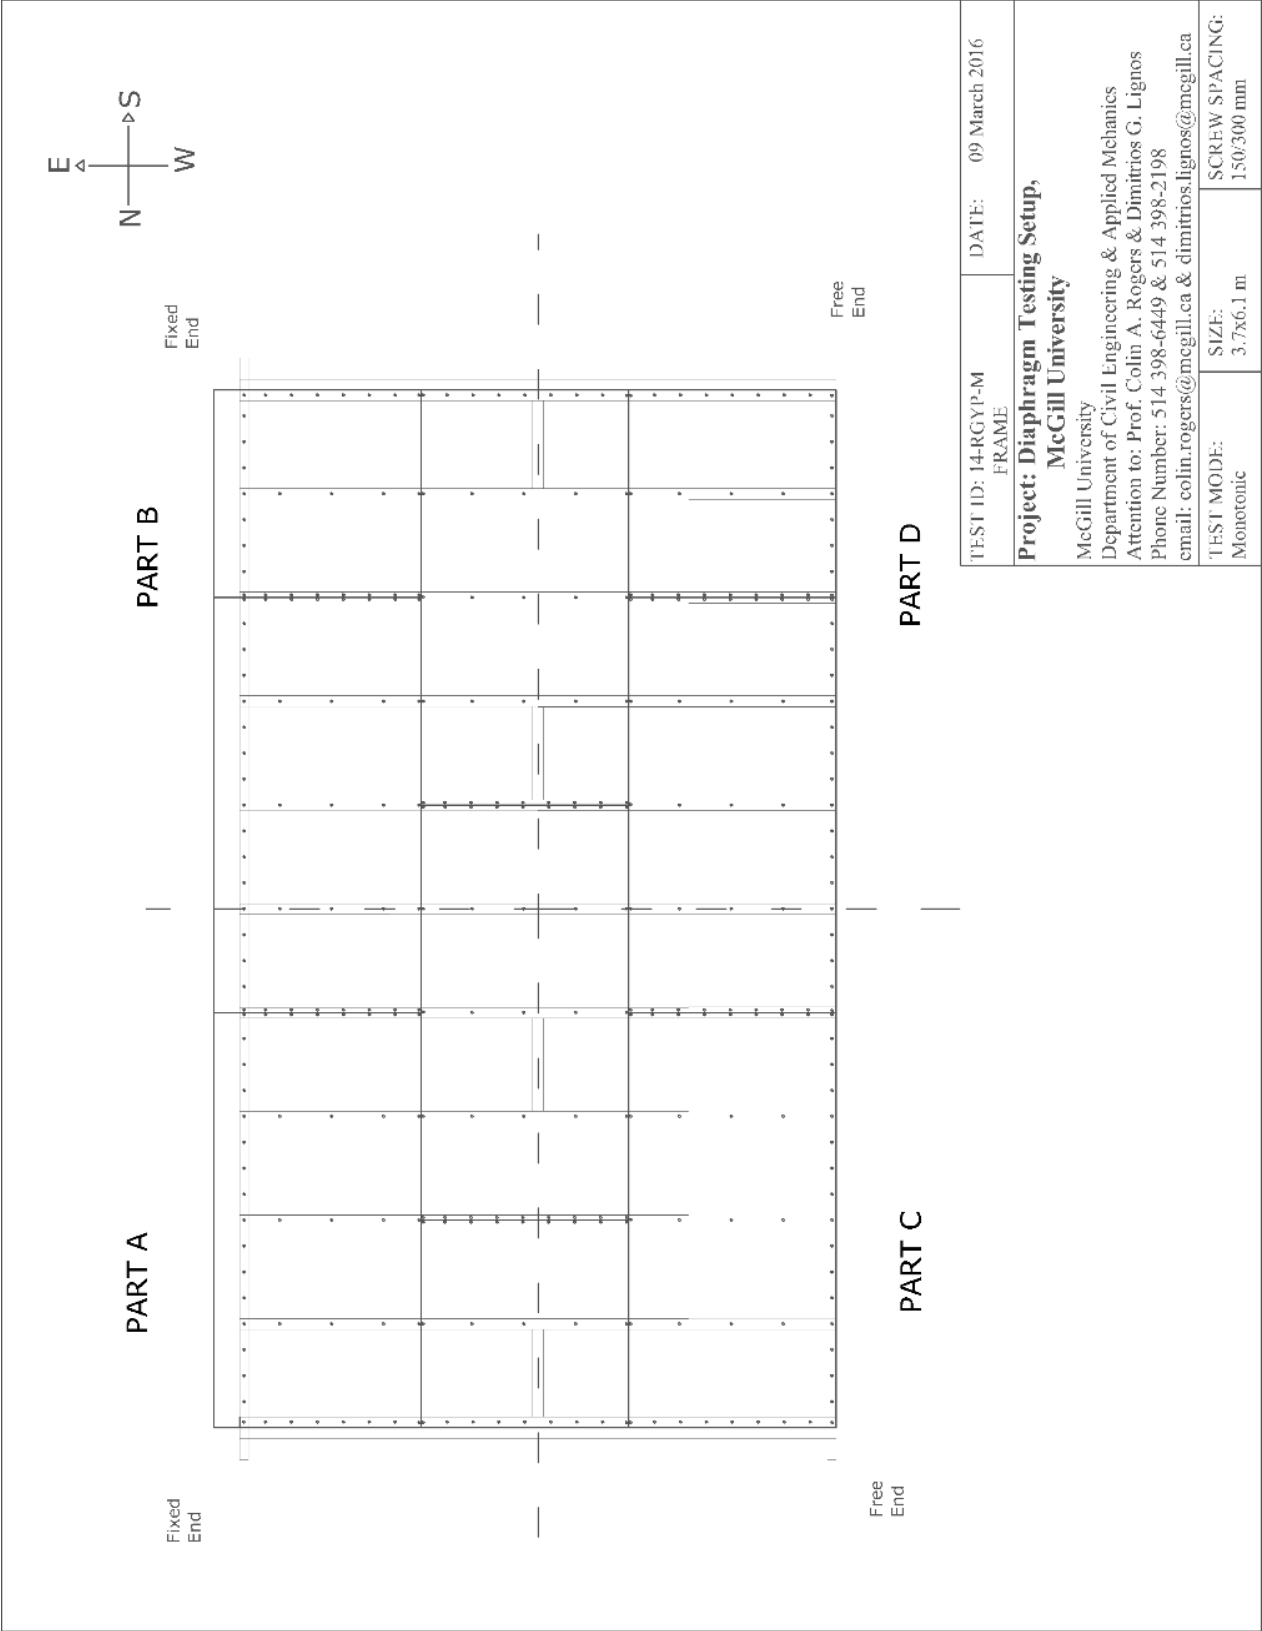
Sheathing Fastener Placement for Specimen 14-RGY-P-M
